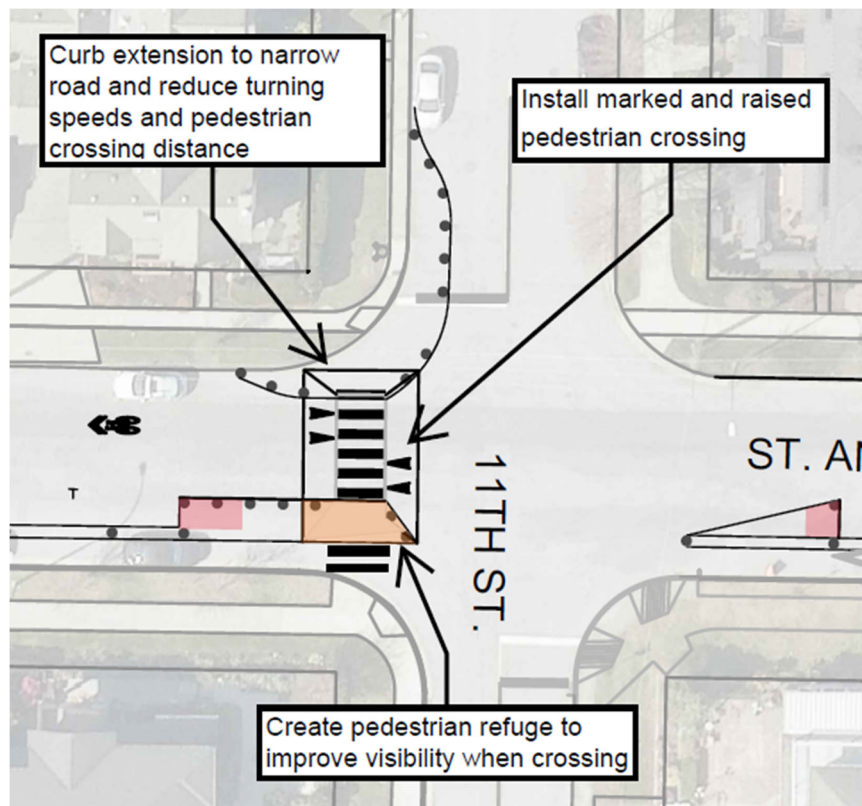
Raised crosswalk on the south side of the St Andrews at 11<sup>th</sup> Street intersection.
